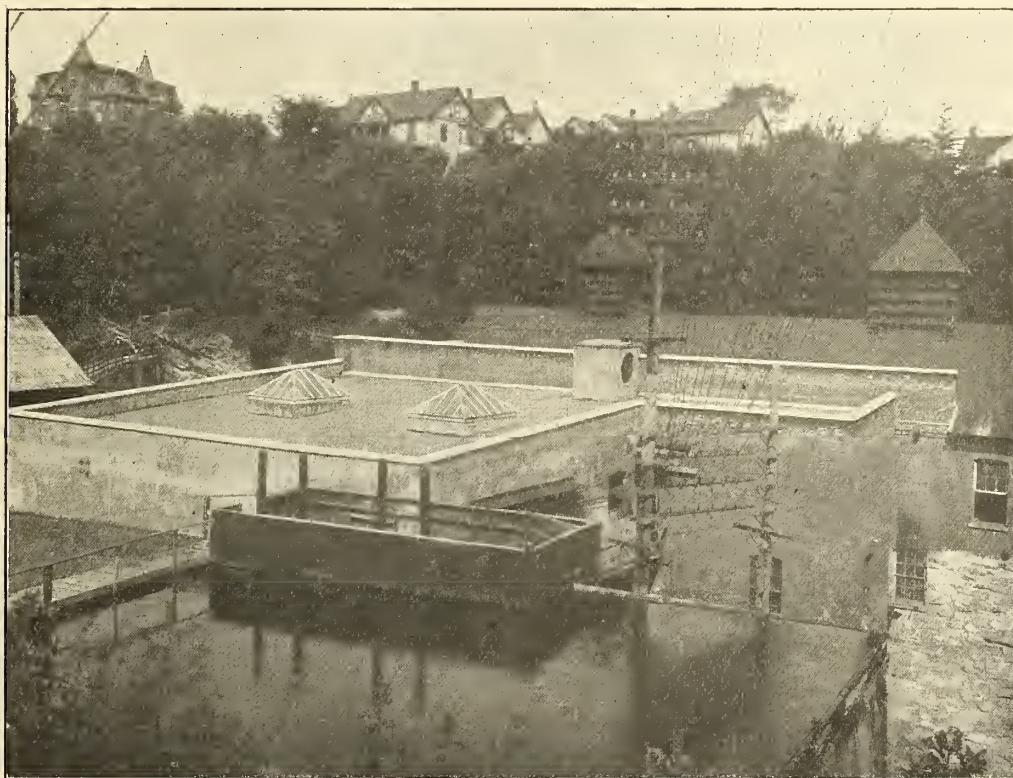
VIEW OF NEW PLANT, SHOWING METHOD OF VENTILATION.
